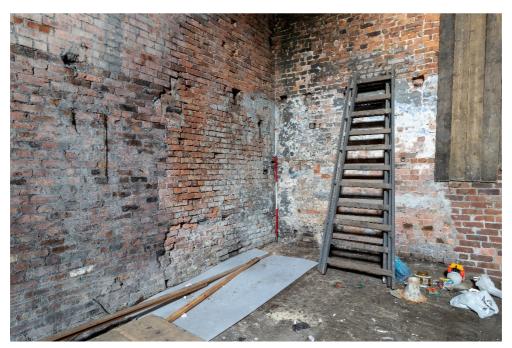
rebuilding and joist slots visible in the walls of Room 10b, facing west.
